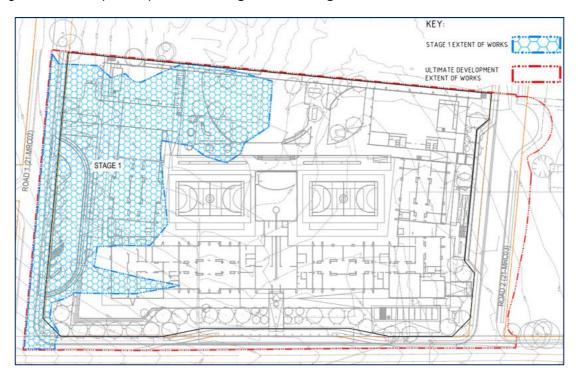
| Approved Stage 1 extent of civil works (Source: SSD-9227 Approved Plans)
